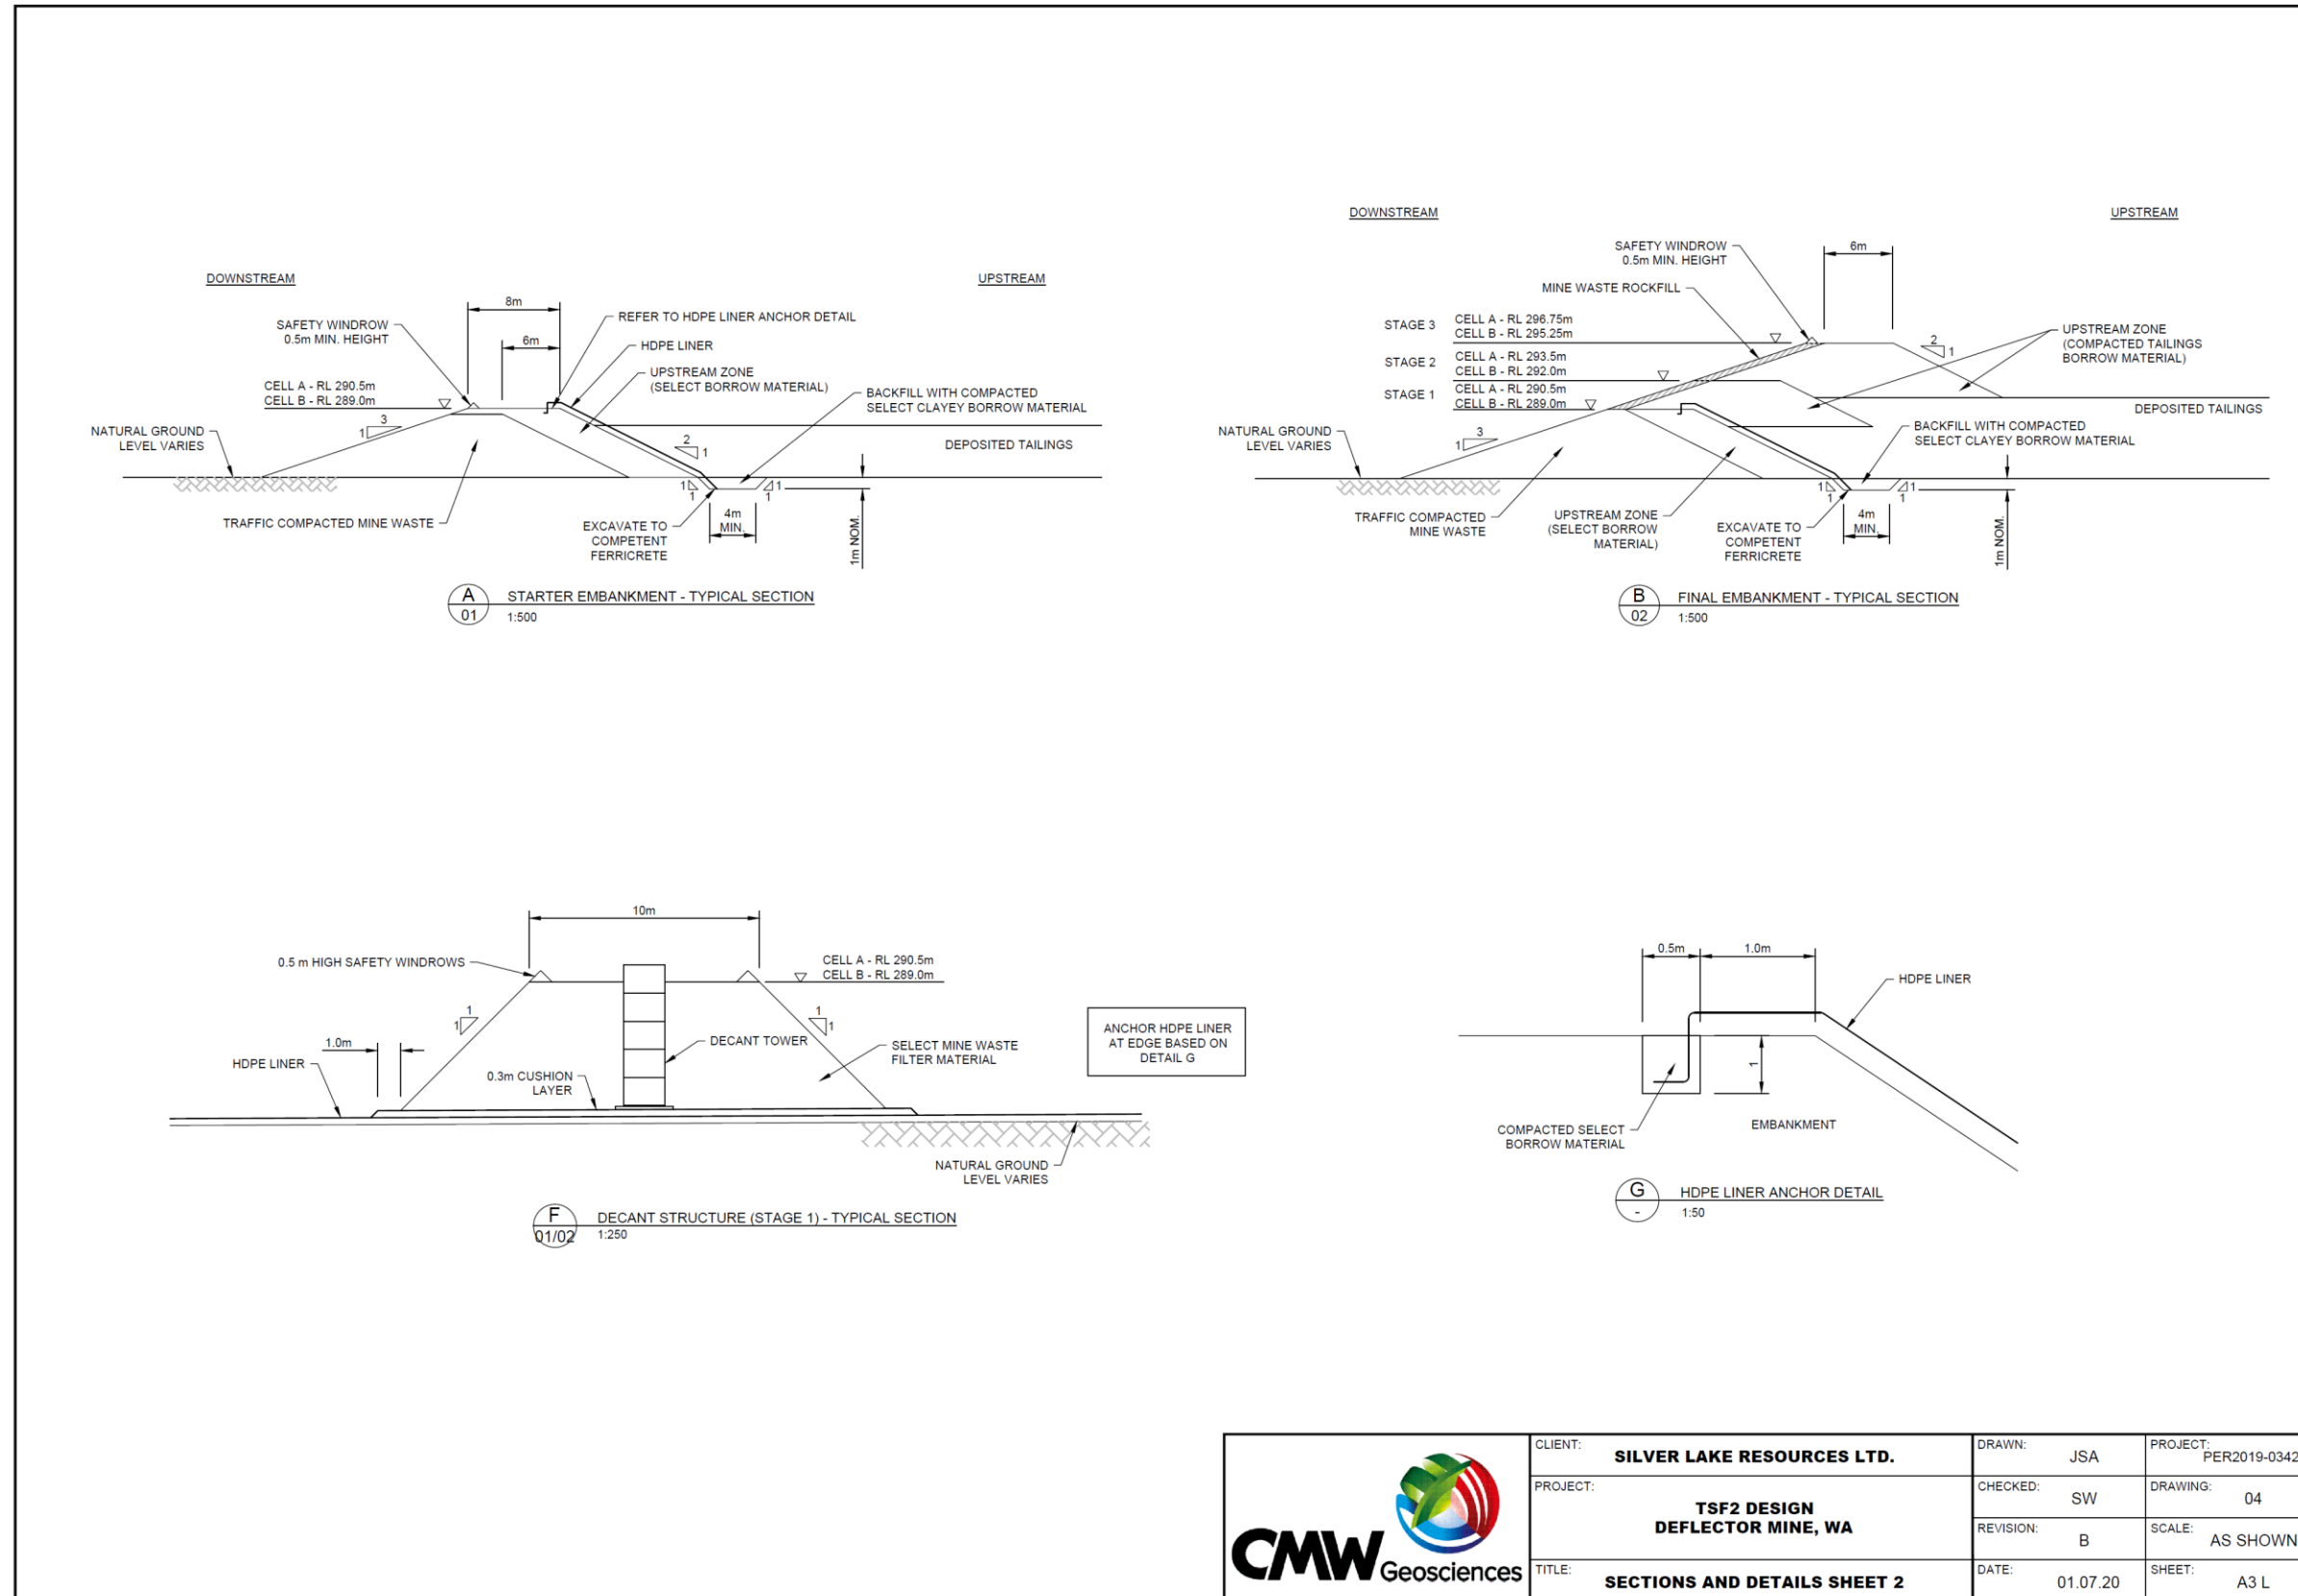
TSF2 Section details from Figure 7 (sections A, B, F and G)
